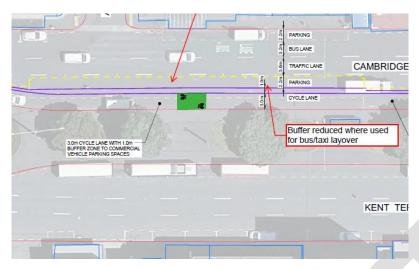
Excerpt from plan - Cambridge Terrace - taxi layover (C302A)
